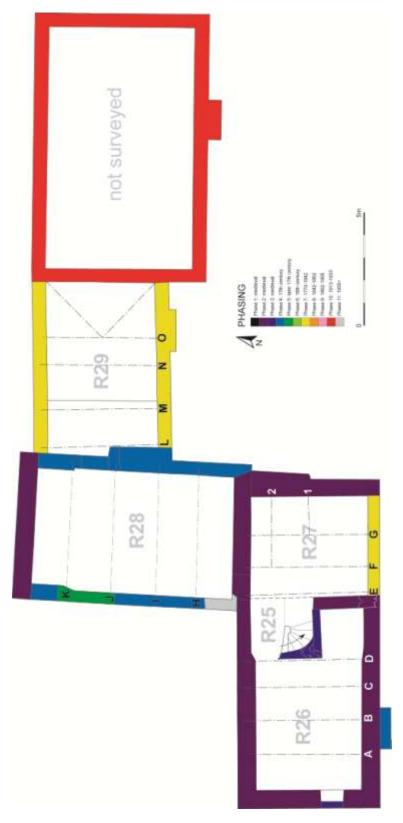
Phased plan of the roofspace, with roof trusses labelled.
